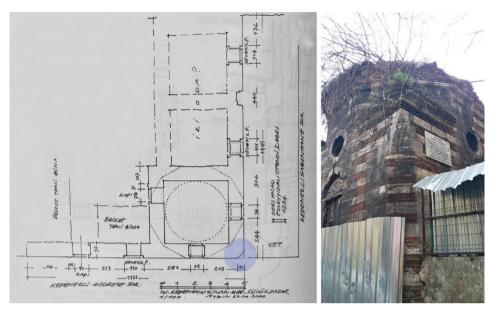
Kepenekçi Sinan Madrasah; a) the location of the corner chamfer in the madrasah plan³¹; b) Corner detail (Author's archive, 2020)
